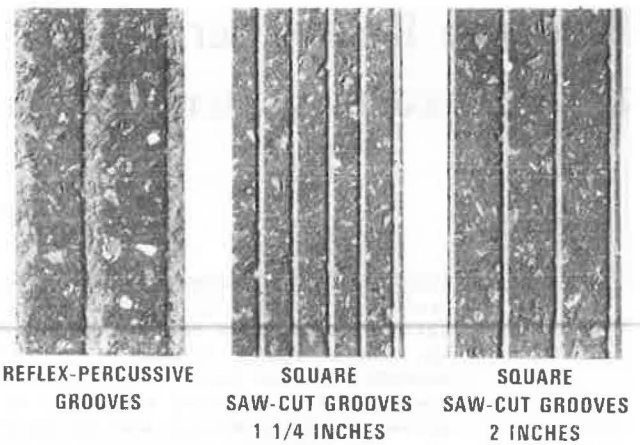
Various test sections of asphaltic concrete test bed (each section is 40 ft long).
